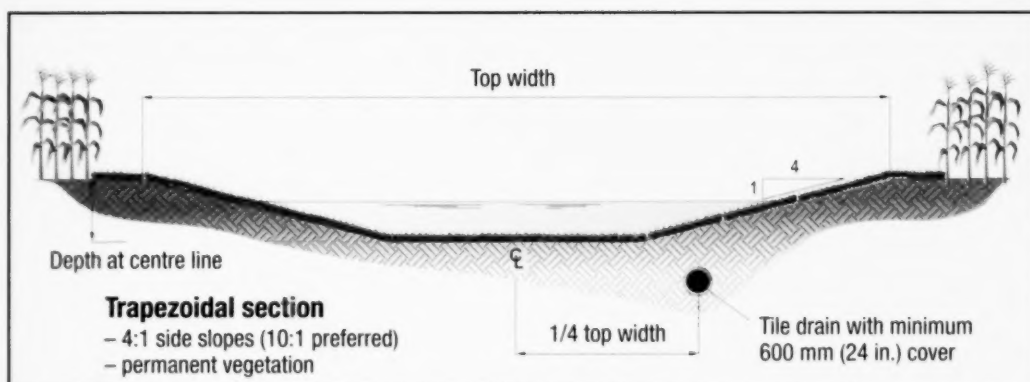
Typical Cross-section of Trapezoidal Grassed Waterway
